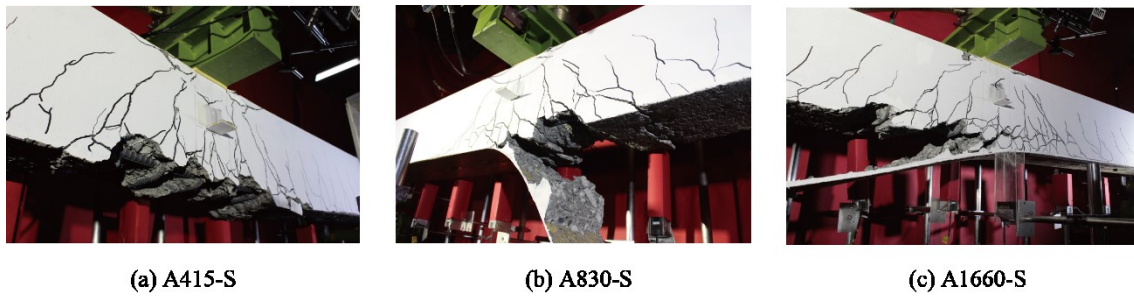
Photograph of debonded sheet close-up with concrete used for beams [51].
